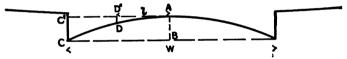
CROSS-SECTION OF PAVEMENT; GUTTERS AT SAME ELEVATION
